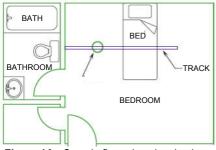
A - Sample floor plan showing basic components of a ceiling hoist system.
